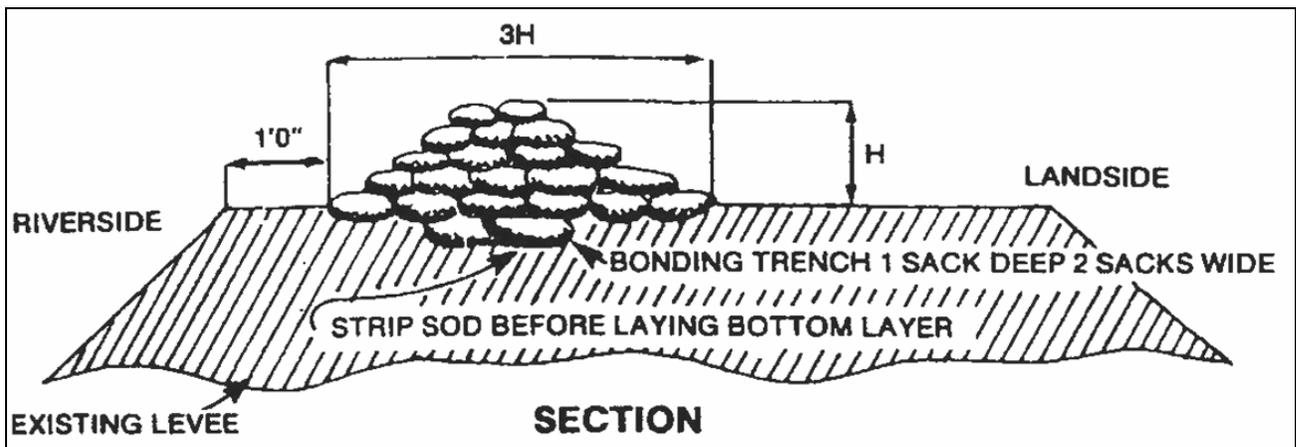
Sketch of a typical levee raise with bonding trench.
